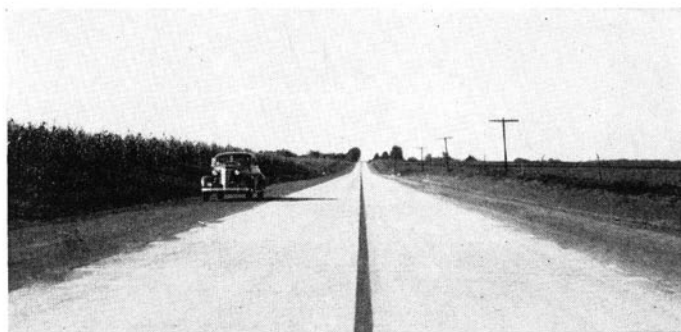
VIEW OF SOUTH EXPERIMENTAL SECTION LOOKING NORTH
